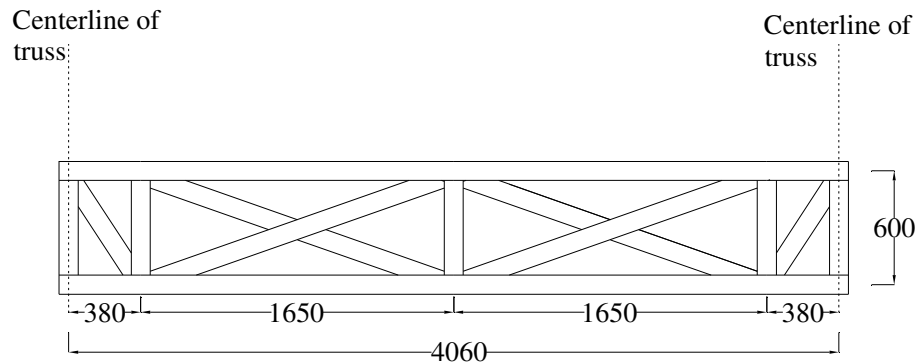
Lattice floor beam made from 4mm thick ST100 section
